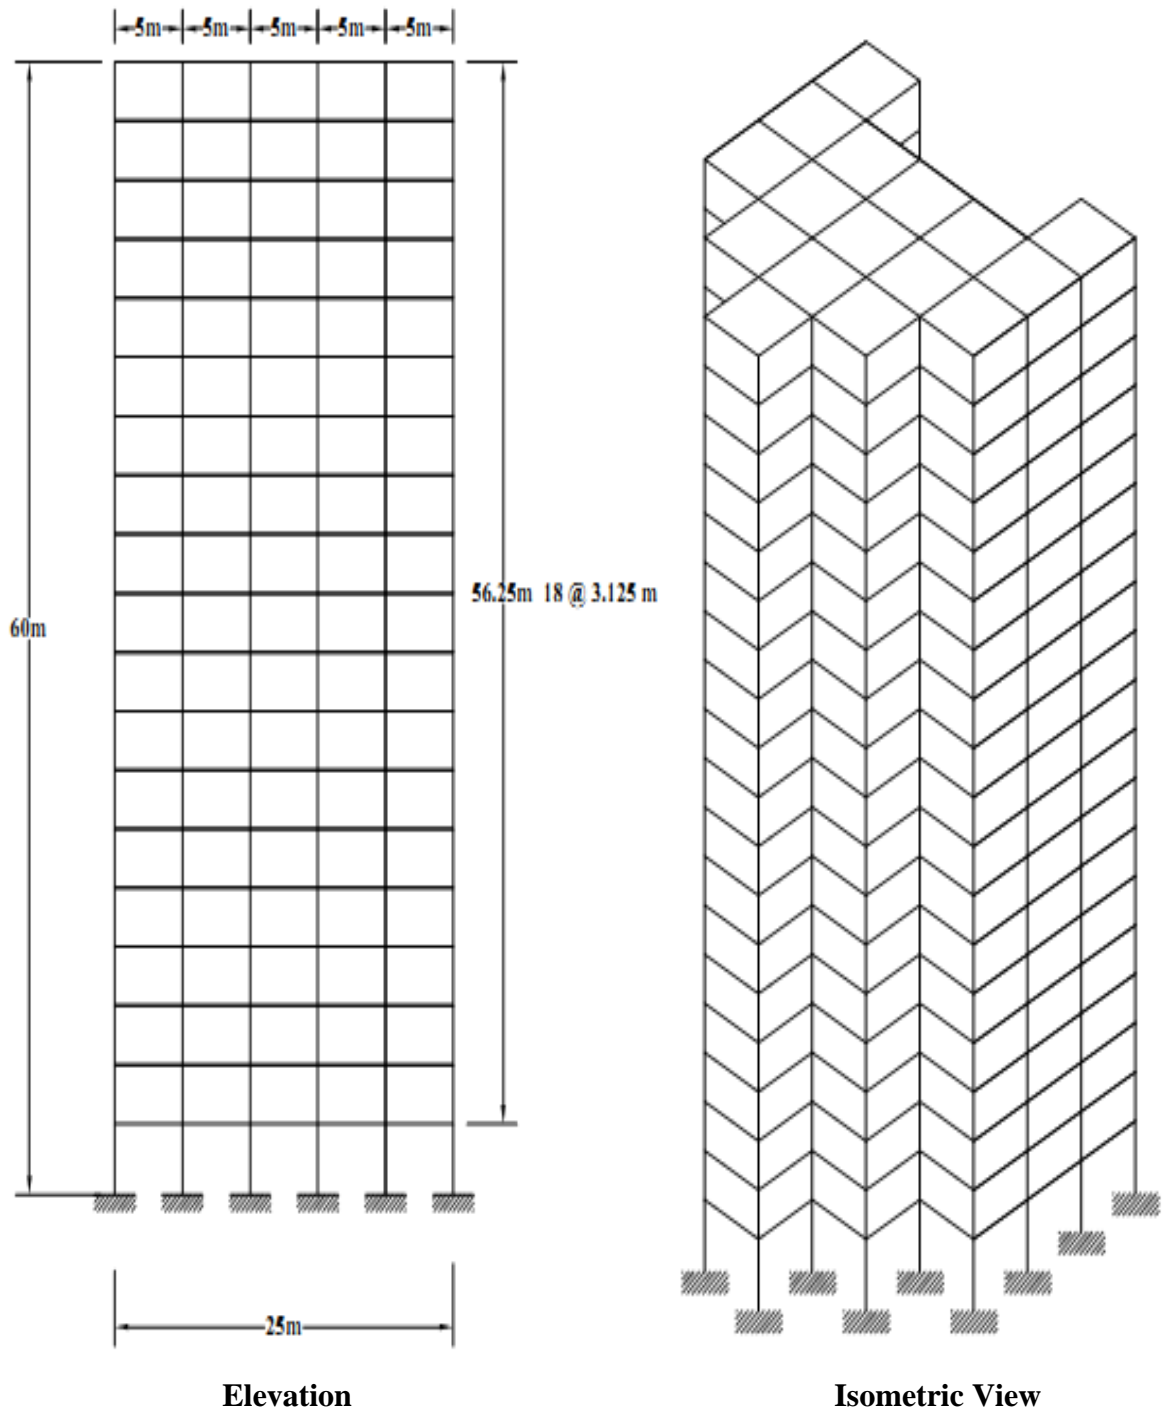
Elevation and isometric view of I-Shape-1 building
